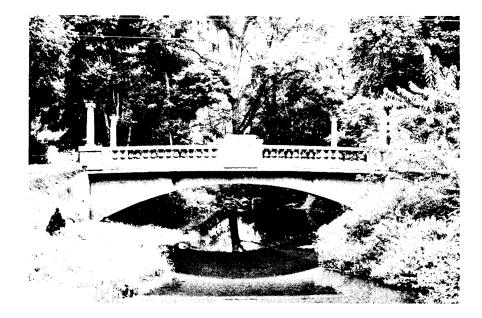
The single-span barrel arch with decorative elements added constitutes Luten's "park bridge." This Luten bridge is located in Bland, Virginia.
